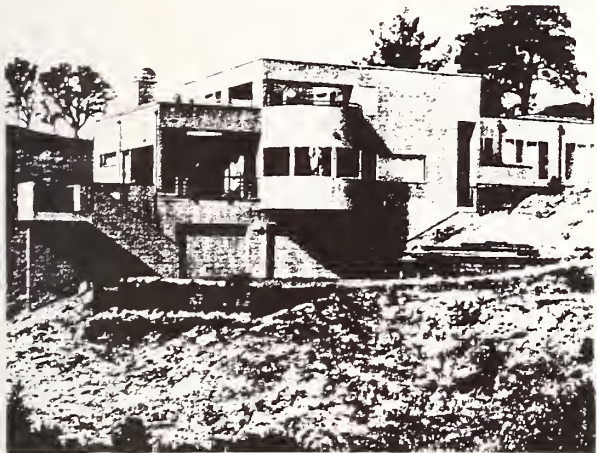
Well constructed split level house with no apparent damage. Two nearby single level homes were damaged, one beyond repair.
